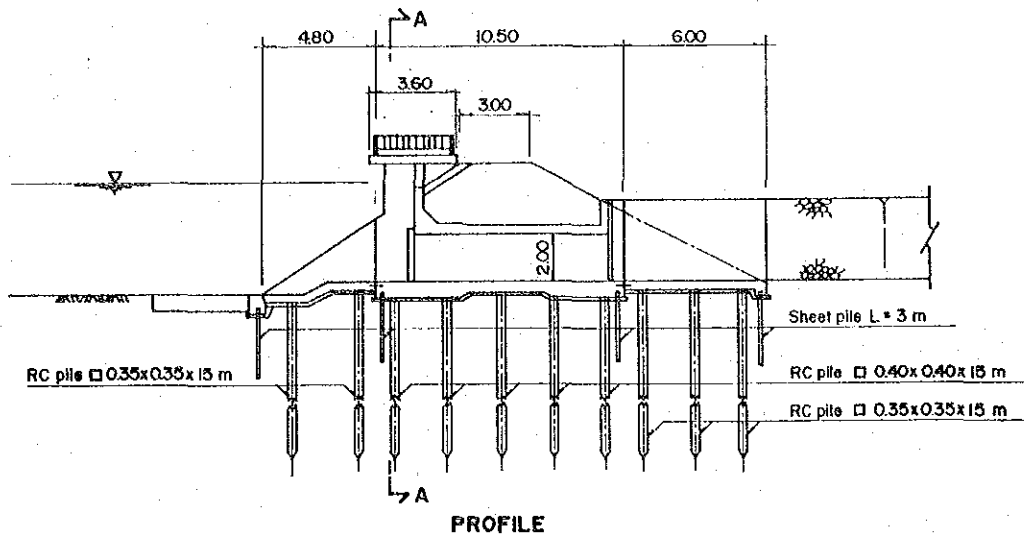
STANDARD DESIGN OF DRAINAGE CULVERT TYPE II (2/3)
